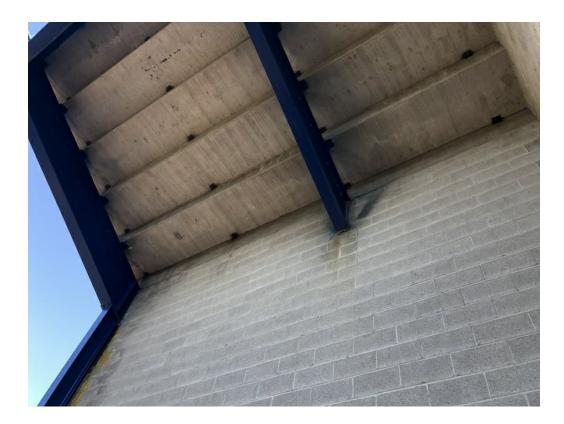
Underside of Precast Seating with Cracking in Masonry Wall at Steel Beam Bearing
